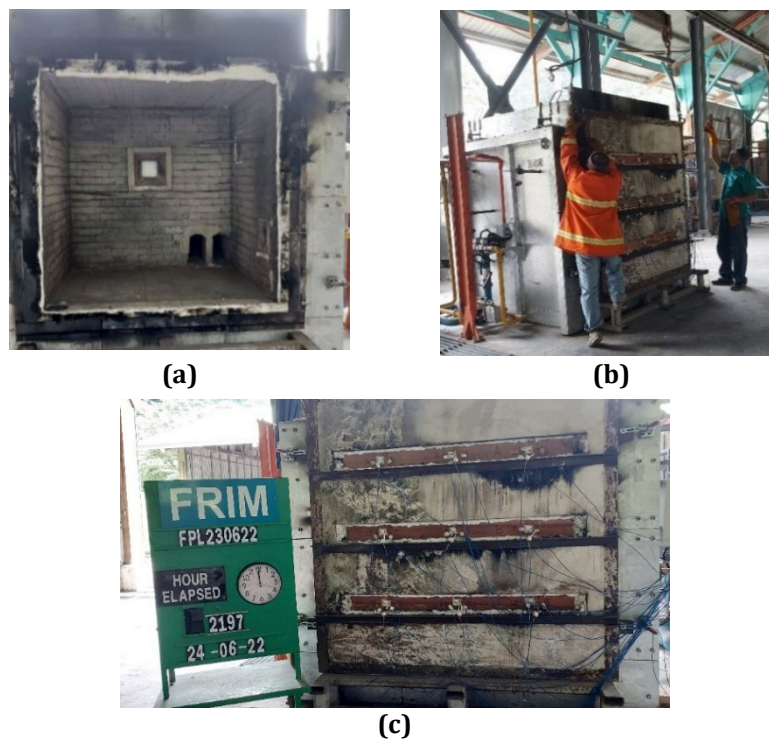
Vertical furnace for fire test - (a) plate thermometers positioned within the furnace; and (b) gas-fired furnace covered by the specimen and additional sheets of gypsum plasterboard
